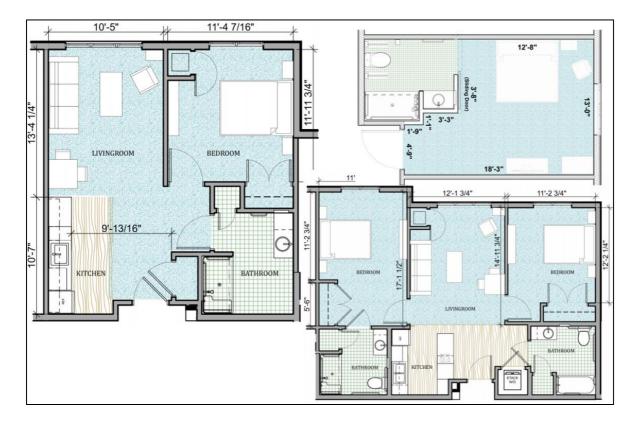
The room alternative plans of The Views Senior Living (URL-27)
